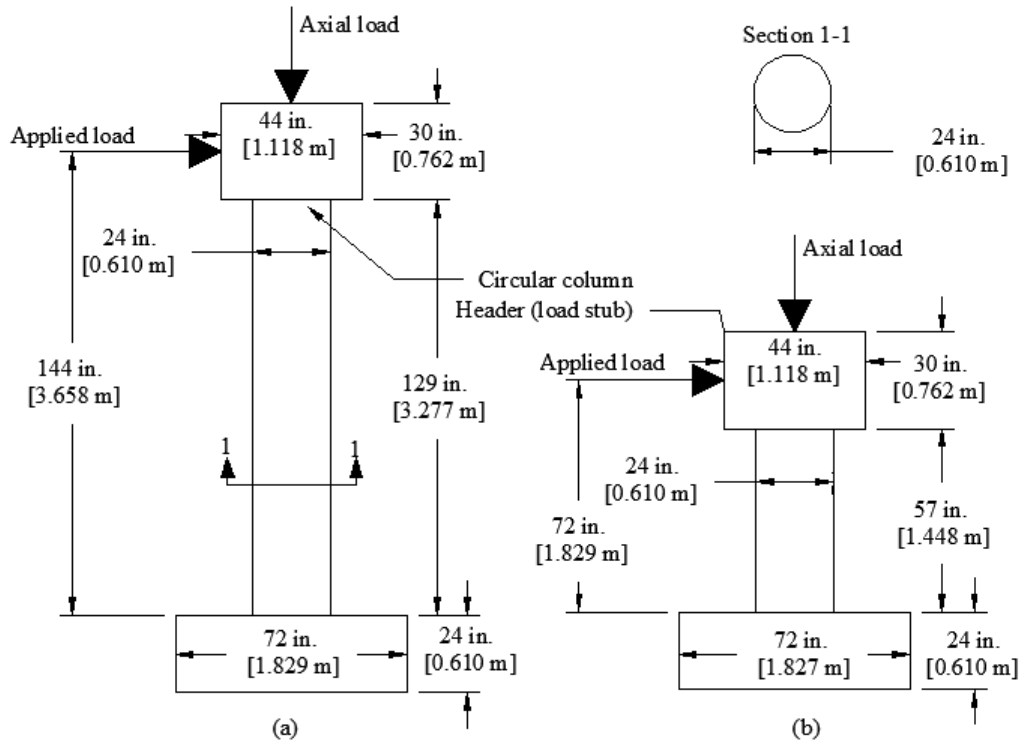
Test elevations for: (a) columns C1 through C4 and (b) columns C5 and C6
